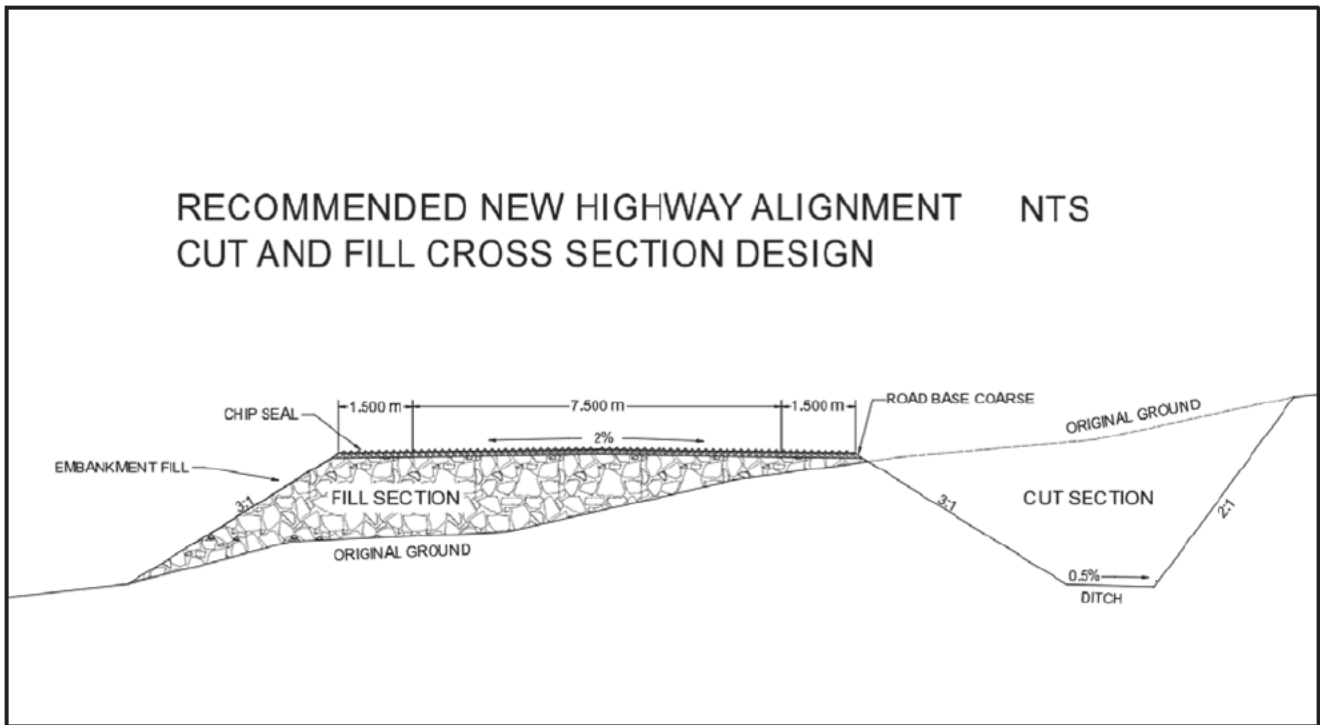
Typical Cross Section Detail for Cut/Fill Road Design.
